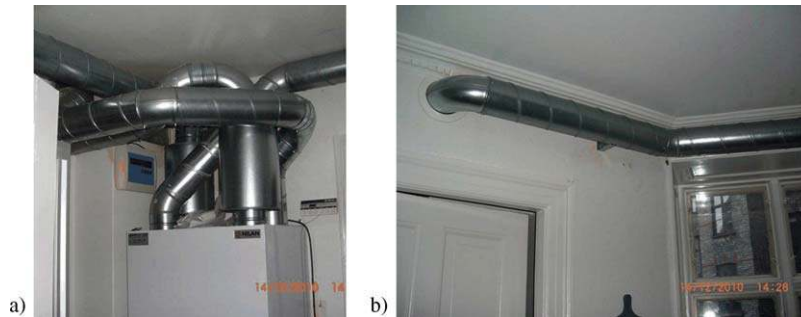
Ventilation ducts in apartment. (a) Inlet and outlet from the air handling unit and (b) duct located in rooms.
